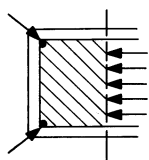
Cross-section of beam with confining action of hoops
